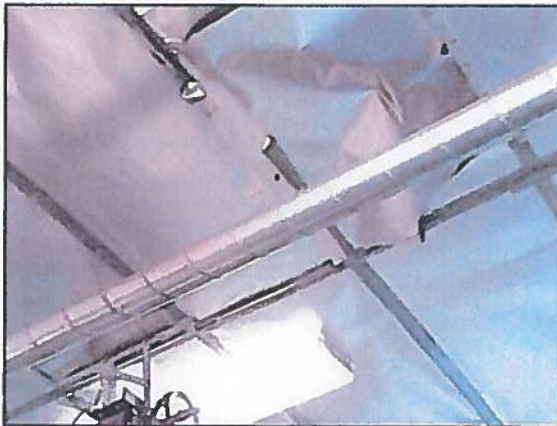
Fire Station 6 – Example of some damaged ceiling sheet insulation
